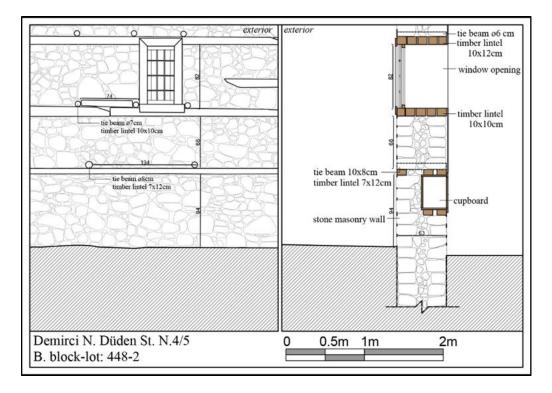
Drawing of stone masonry wall with timber lintels (Demirci N. b.block-lot: 448-2)
